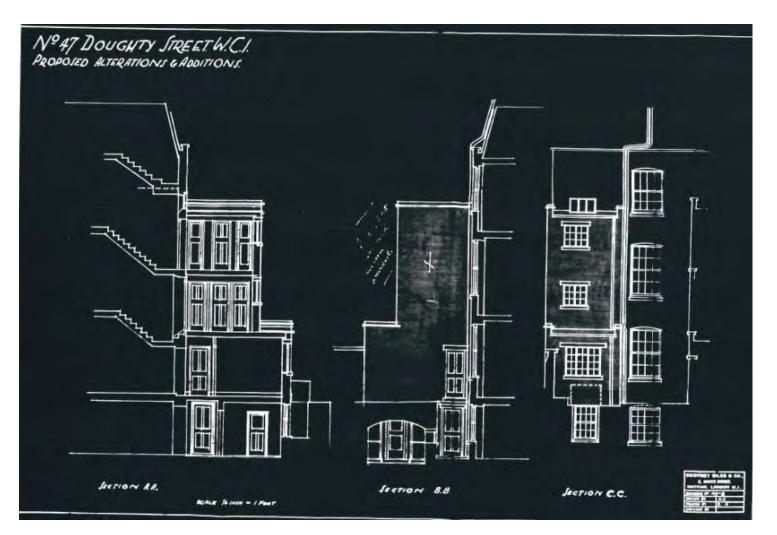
1935 Elevation and Sections showing rebuilt closet wing at No.47
